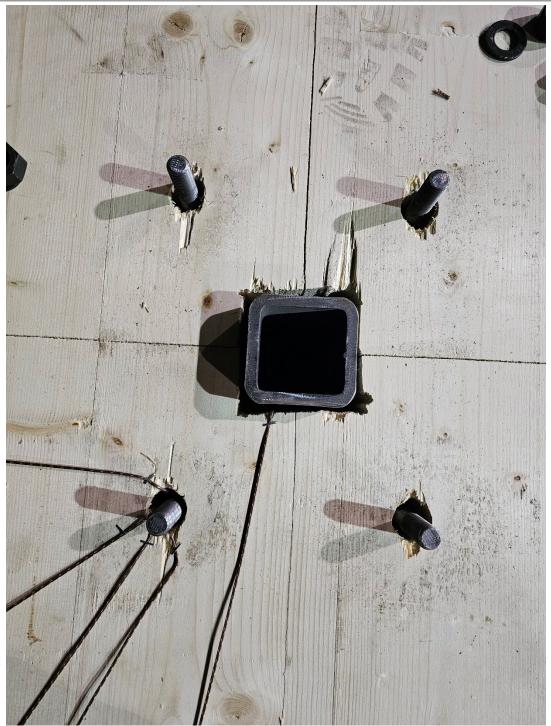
CLT panel joints and steel column connection prior to steel plate installation.
